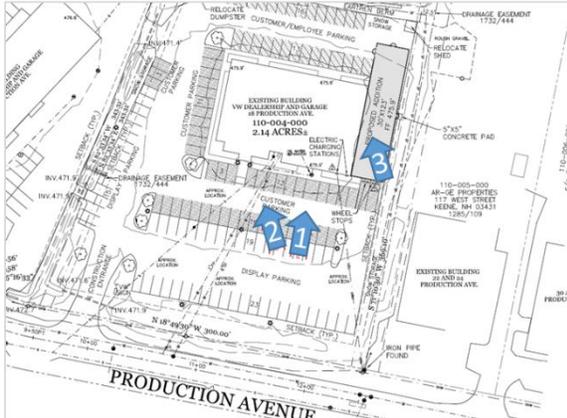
IMAGE / EXCERPT OF PROPOSED SITE PLAN
